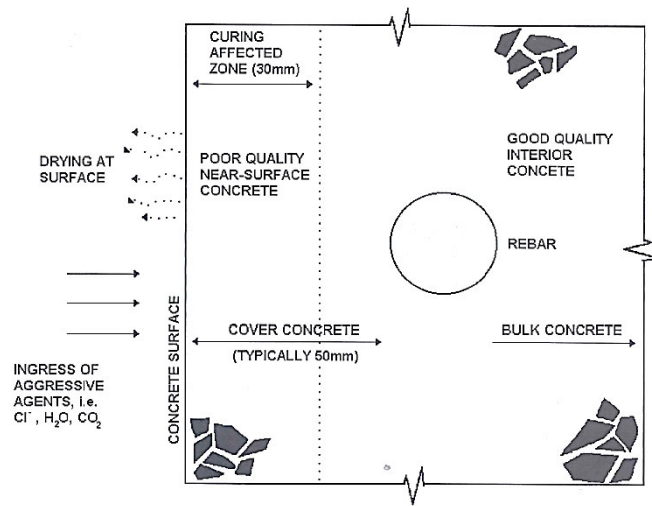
Drawing depicting the concrete cover zone (Source: Owens, 2013)
